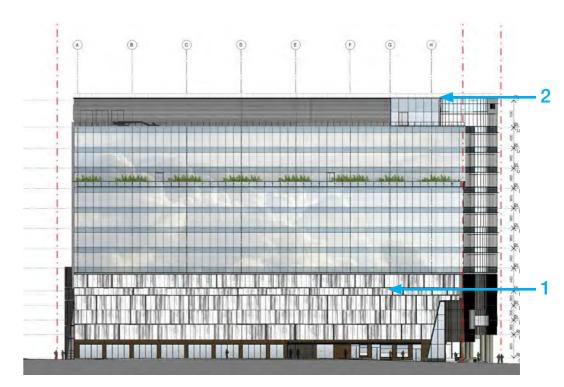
Section 96 NW Plot Proposed Carpark Cladding Material
